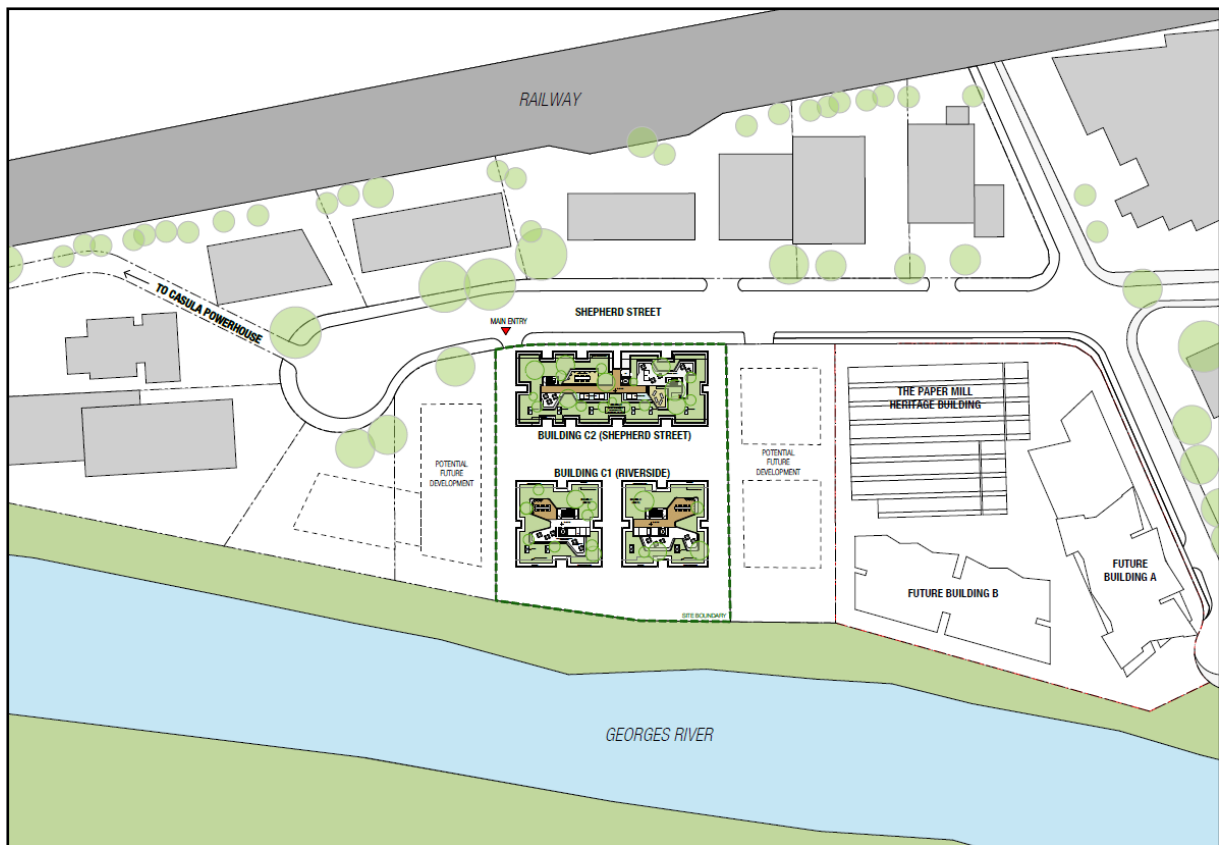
Contextual plan and site analysis (source Woods Bagot)
